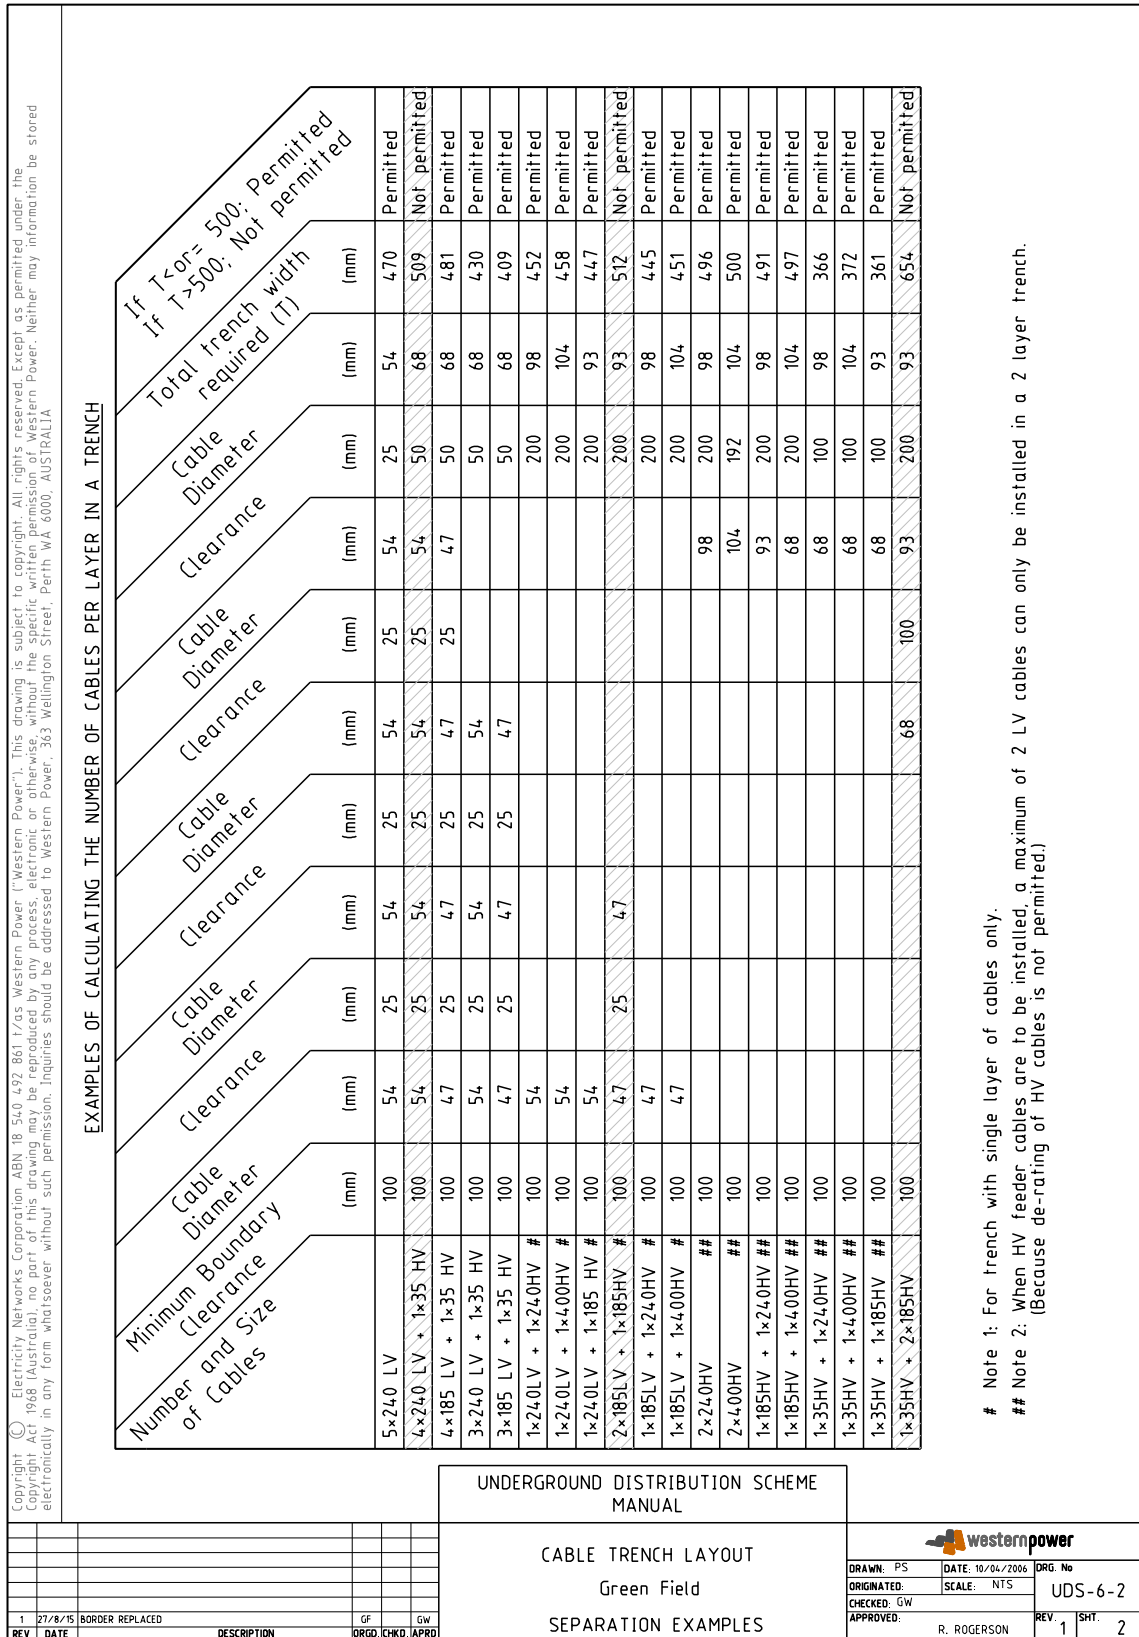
Cable Trench Layout (Sheet 2 of 7)
